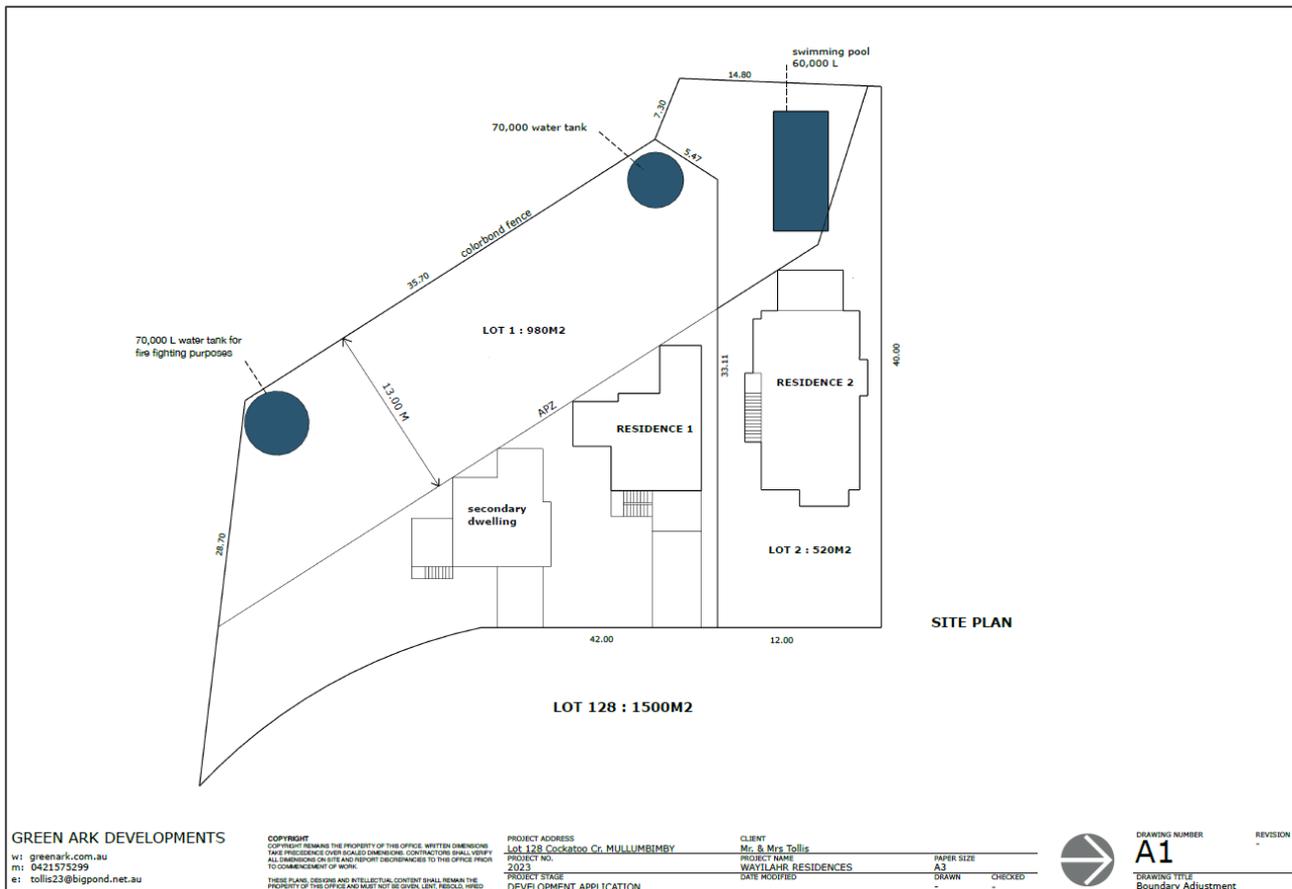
Plan of subdivision and proposed dwellings (larger image in Appendix B)
